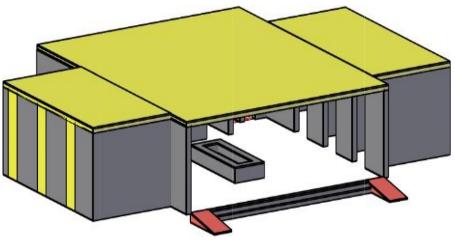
3D LAYOUT OF MUSEUM BUILDING
